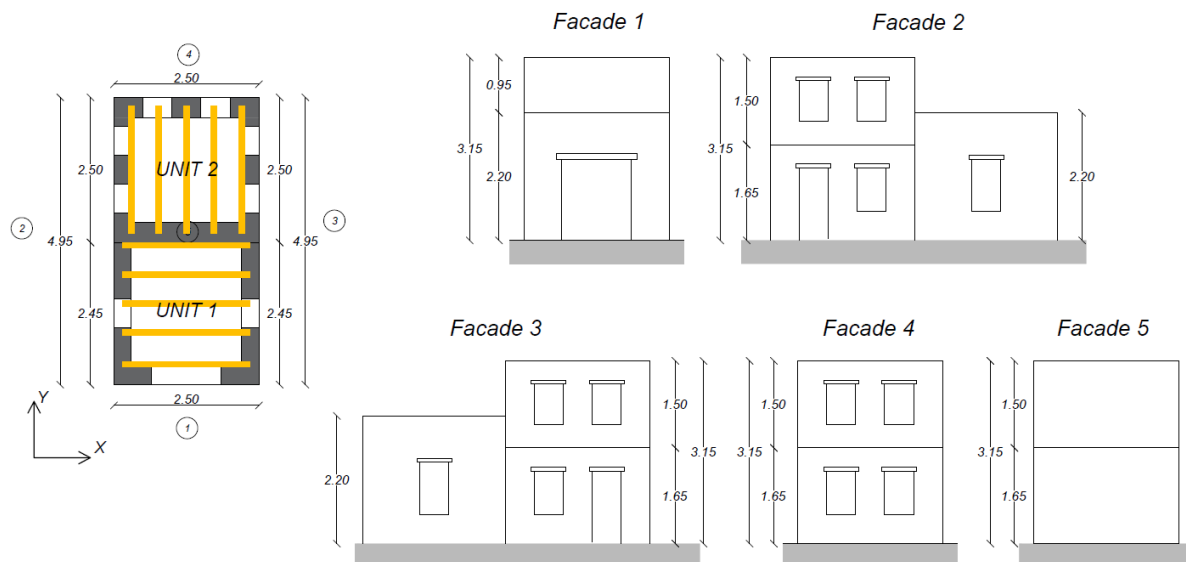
SERA AIMS test specimen floor plan with beam orientation and facade layout of the two units [3]
